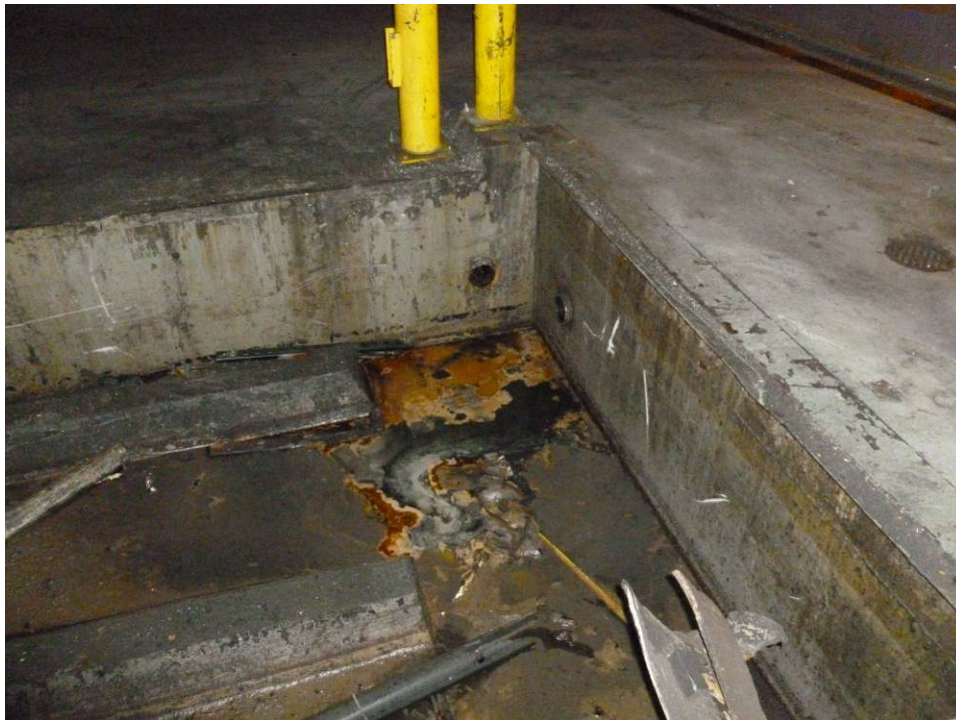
(AOI-14) Equipment Pit near Columns A3/A2. Note oily coolant/water remaining in pit. Photo taken facing south.
